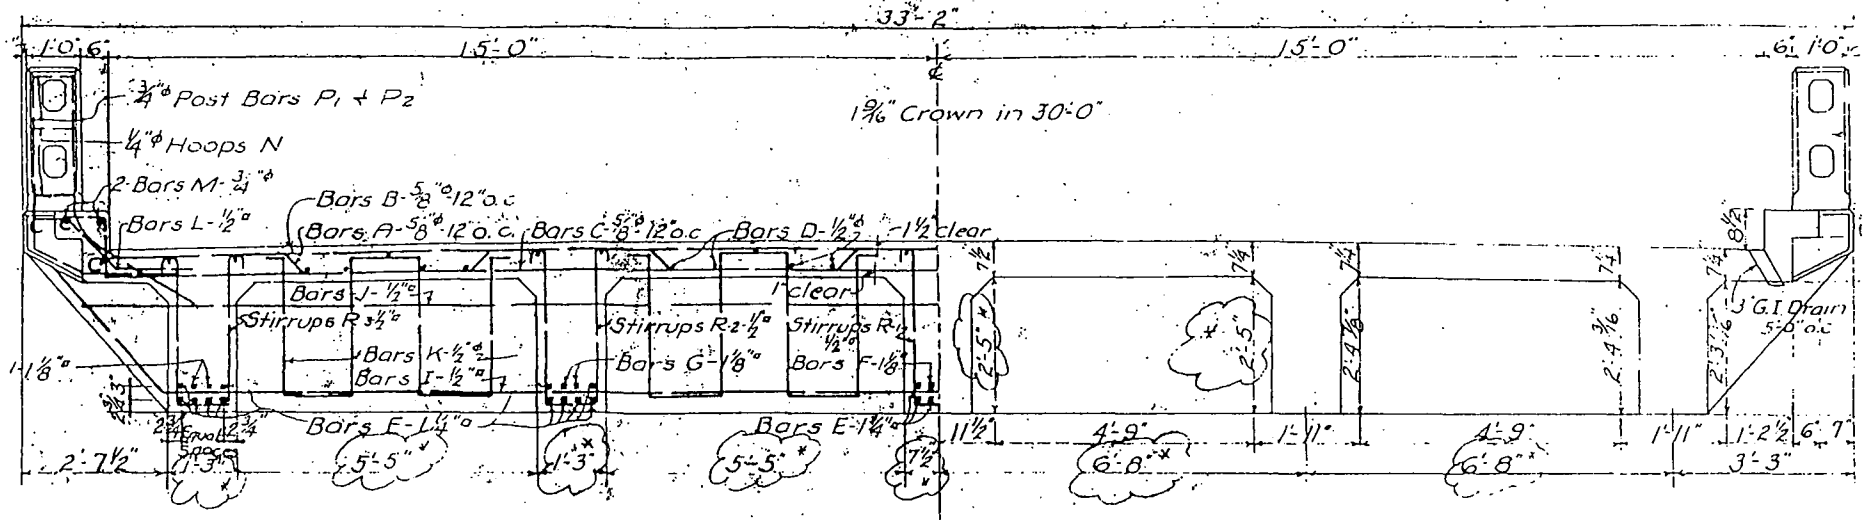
Cross Section at Concrete Tee-Beam Span
